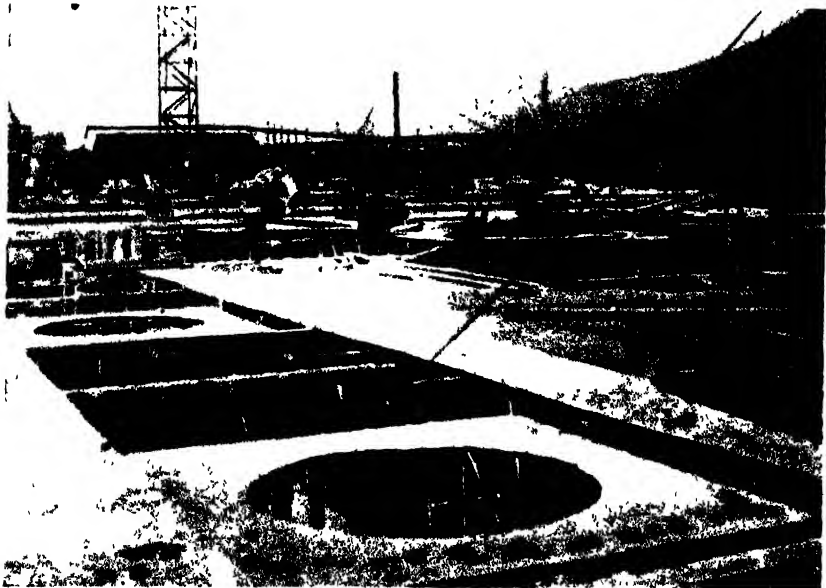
DESAIERIERS SYSTEM OF STEEL DECK FORMS.
